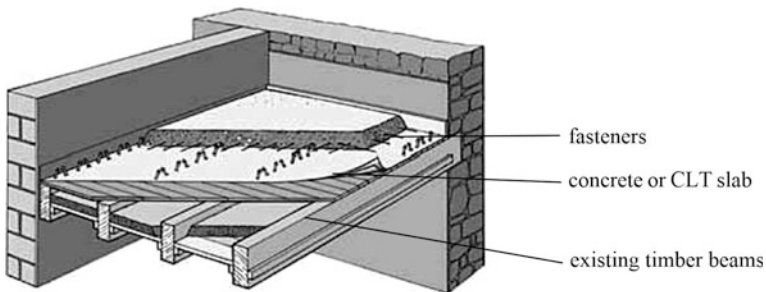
Type of reconstruction of old timber floors with a concrete slab placed in the compressive zone [70]
